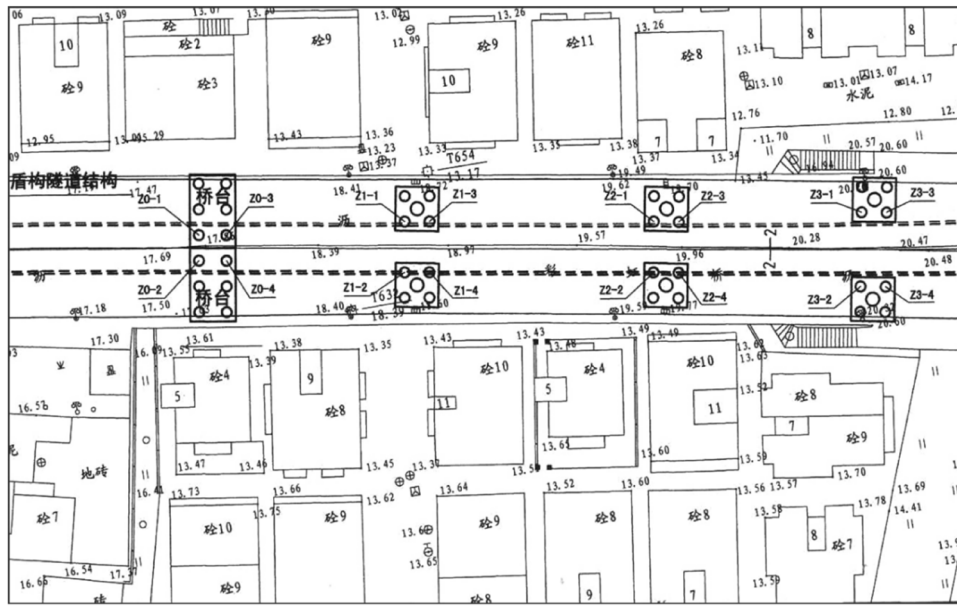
Plane position relationship between viaduct abutment and excavated tunnel
